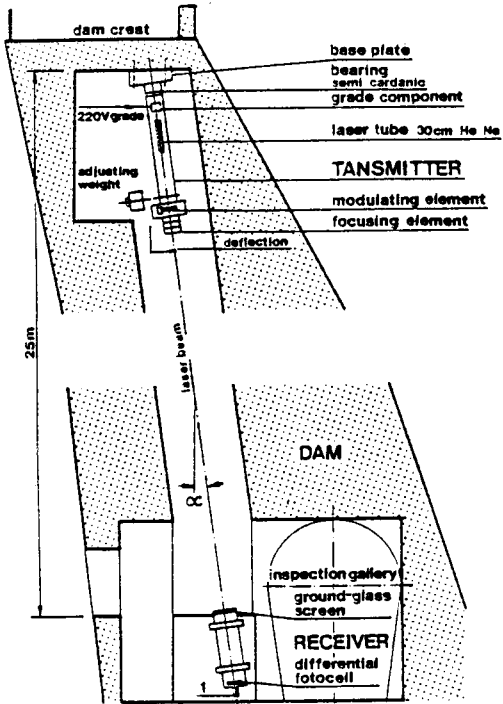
Zillergründl arch dam, typical section with installations for measurement of deformations and waterpressure below the dam
